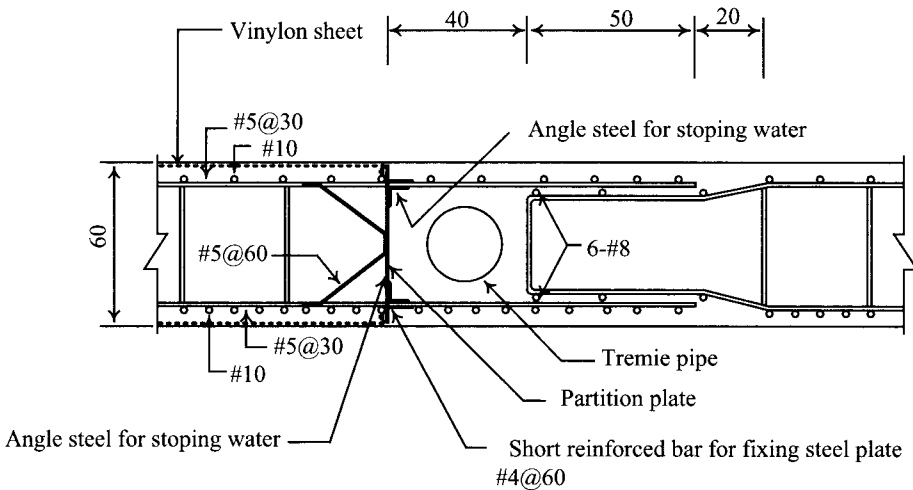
Joint of diaphragm walls: the end-plate method (unit: cm).
